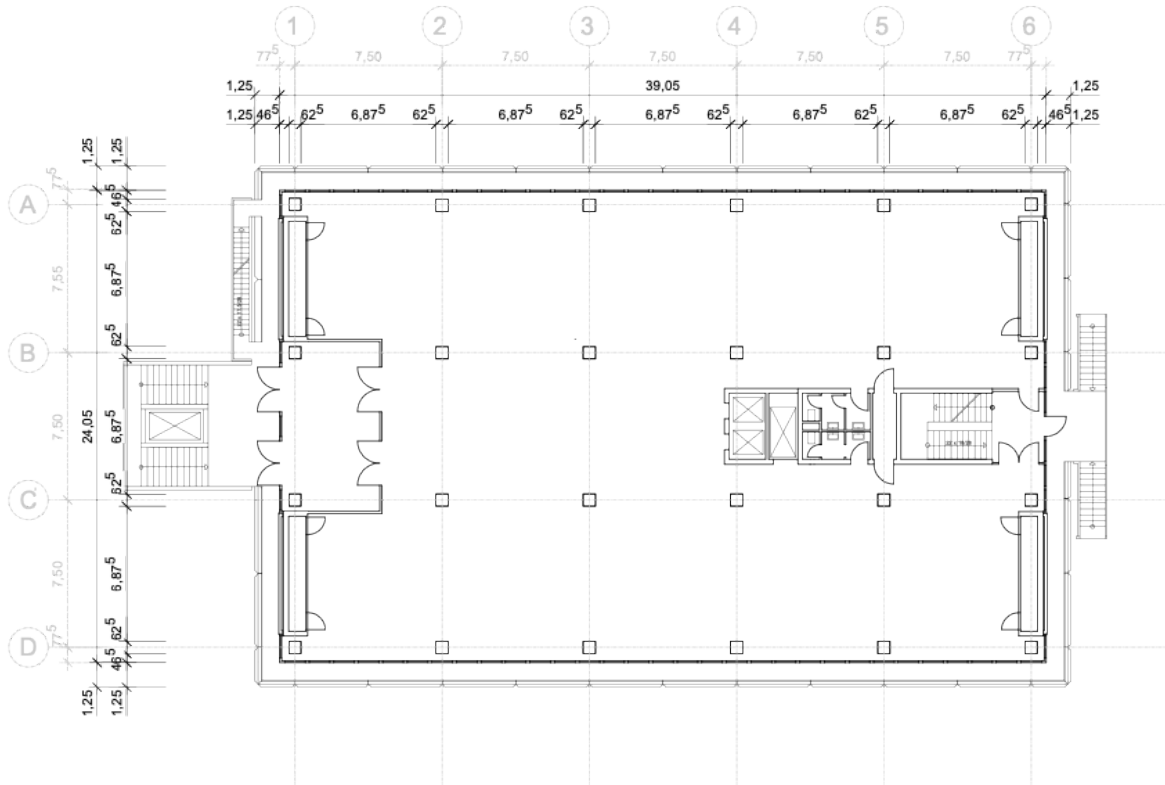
Ground floor of the existing building under investigation for the timber-reuse retrofitting.
